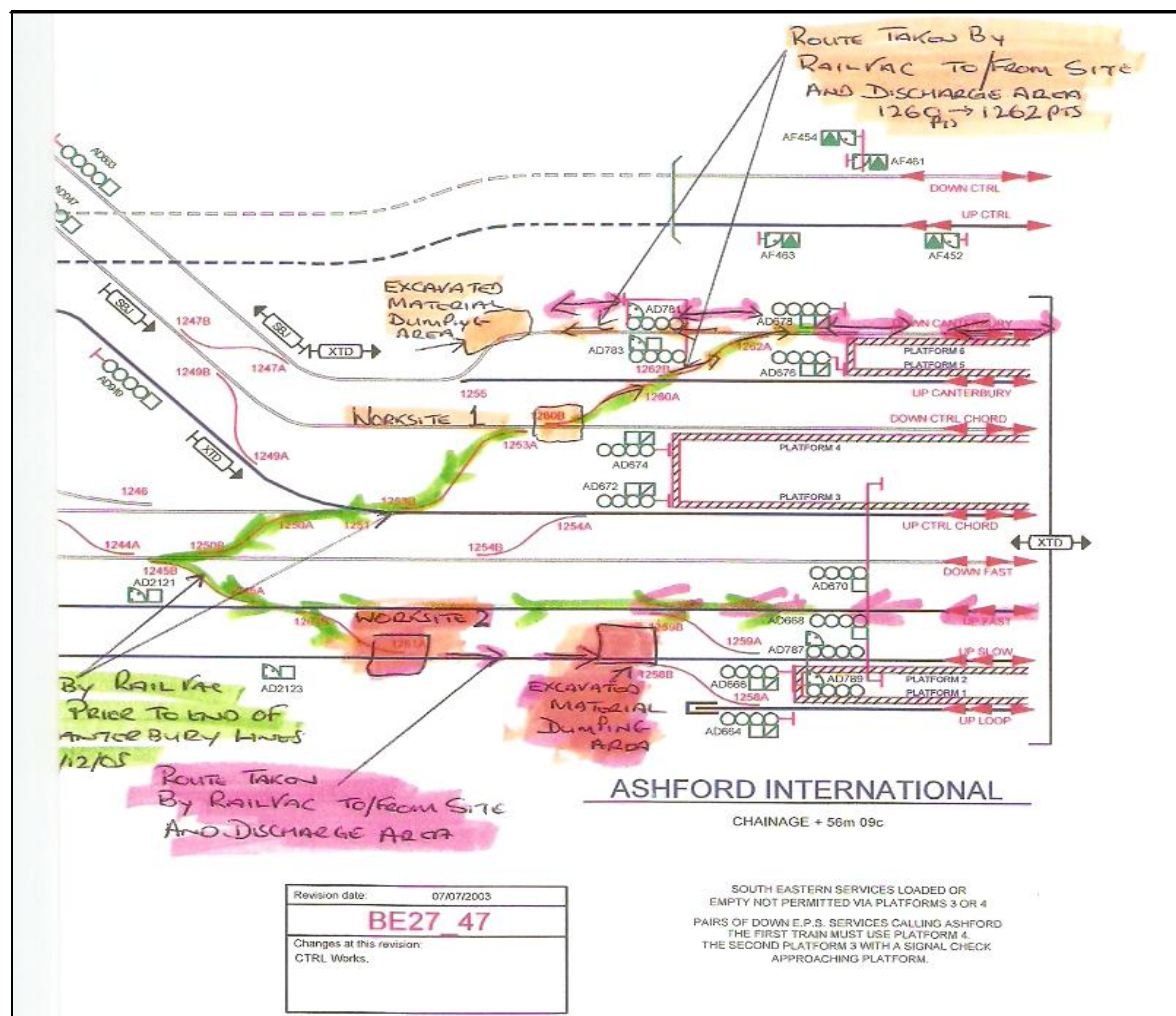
Working Site Diagram Layout at Ashford International Station (Source: author)
